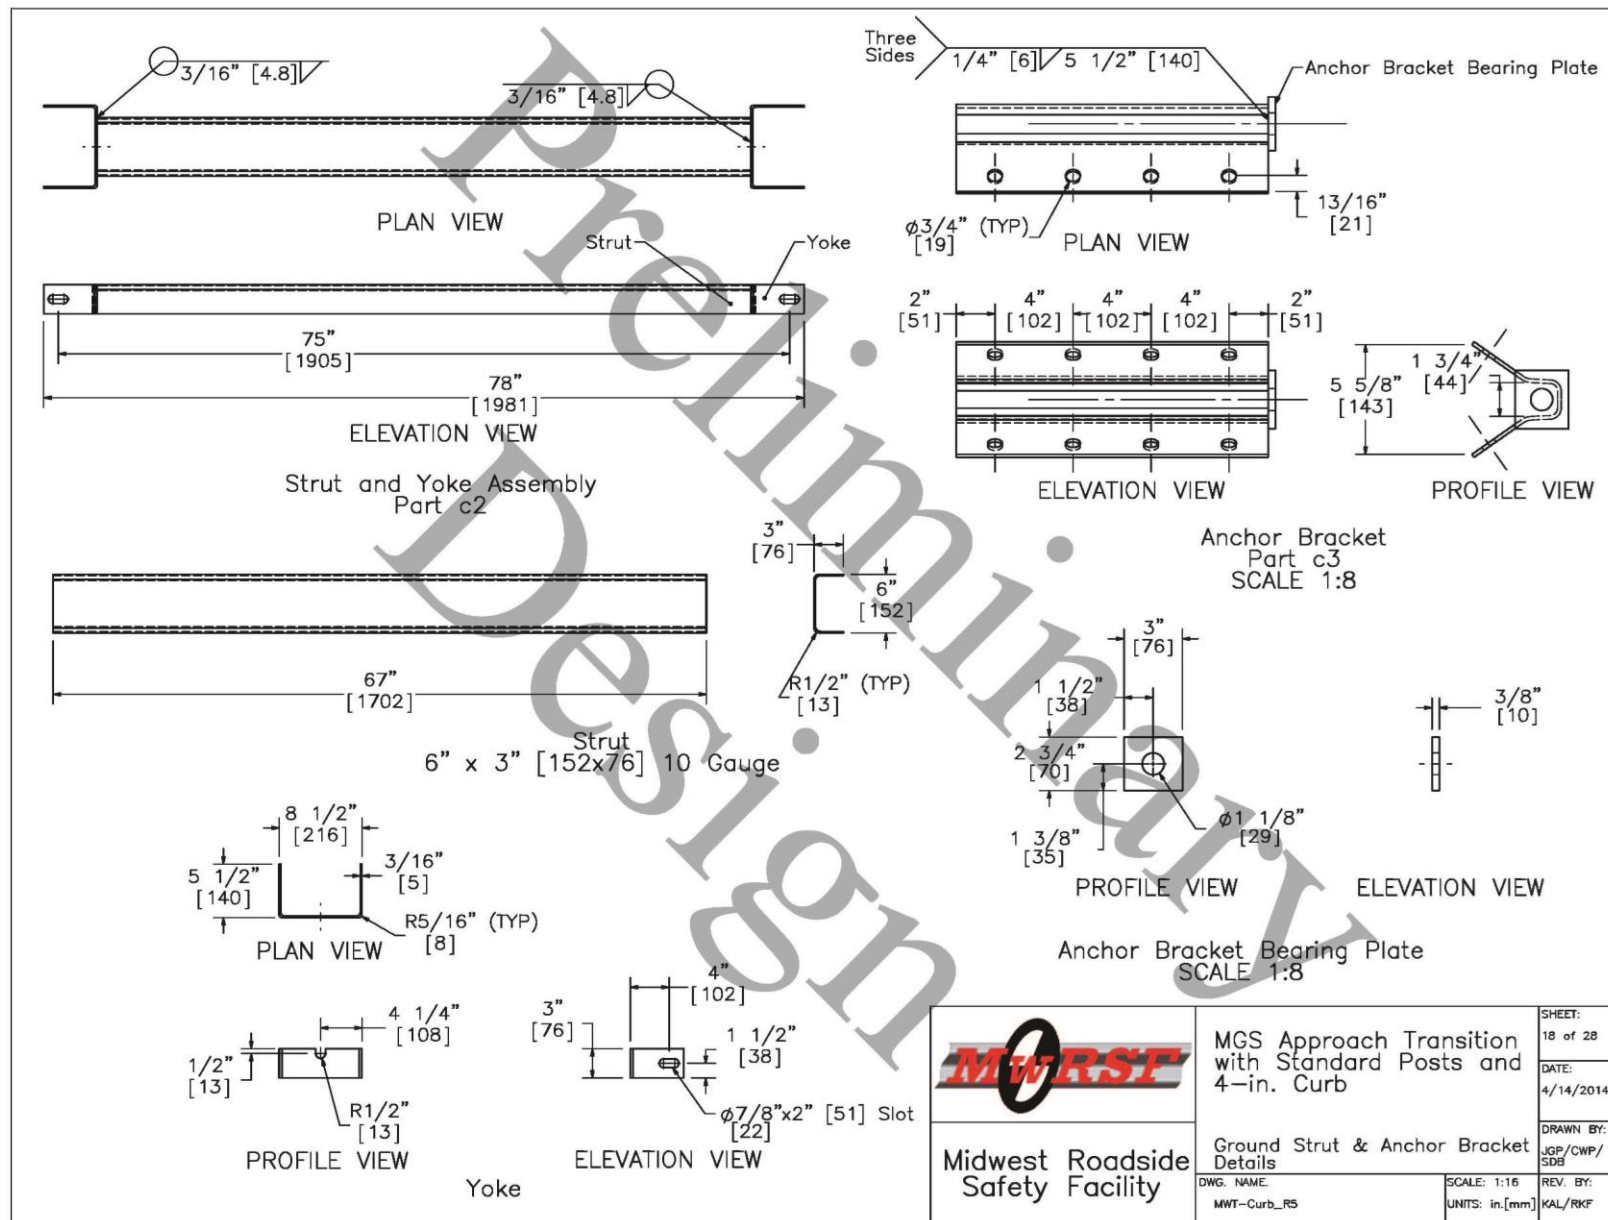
Ground Strut and Anchor Bracket Details, Test No. MWTC-1
